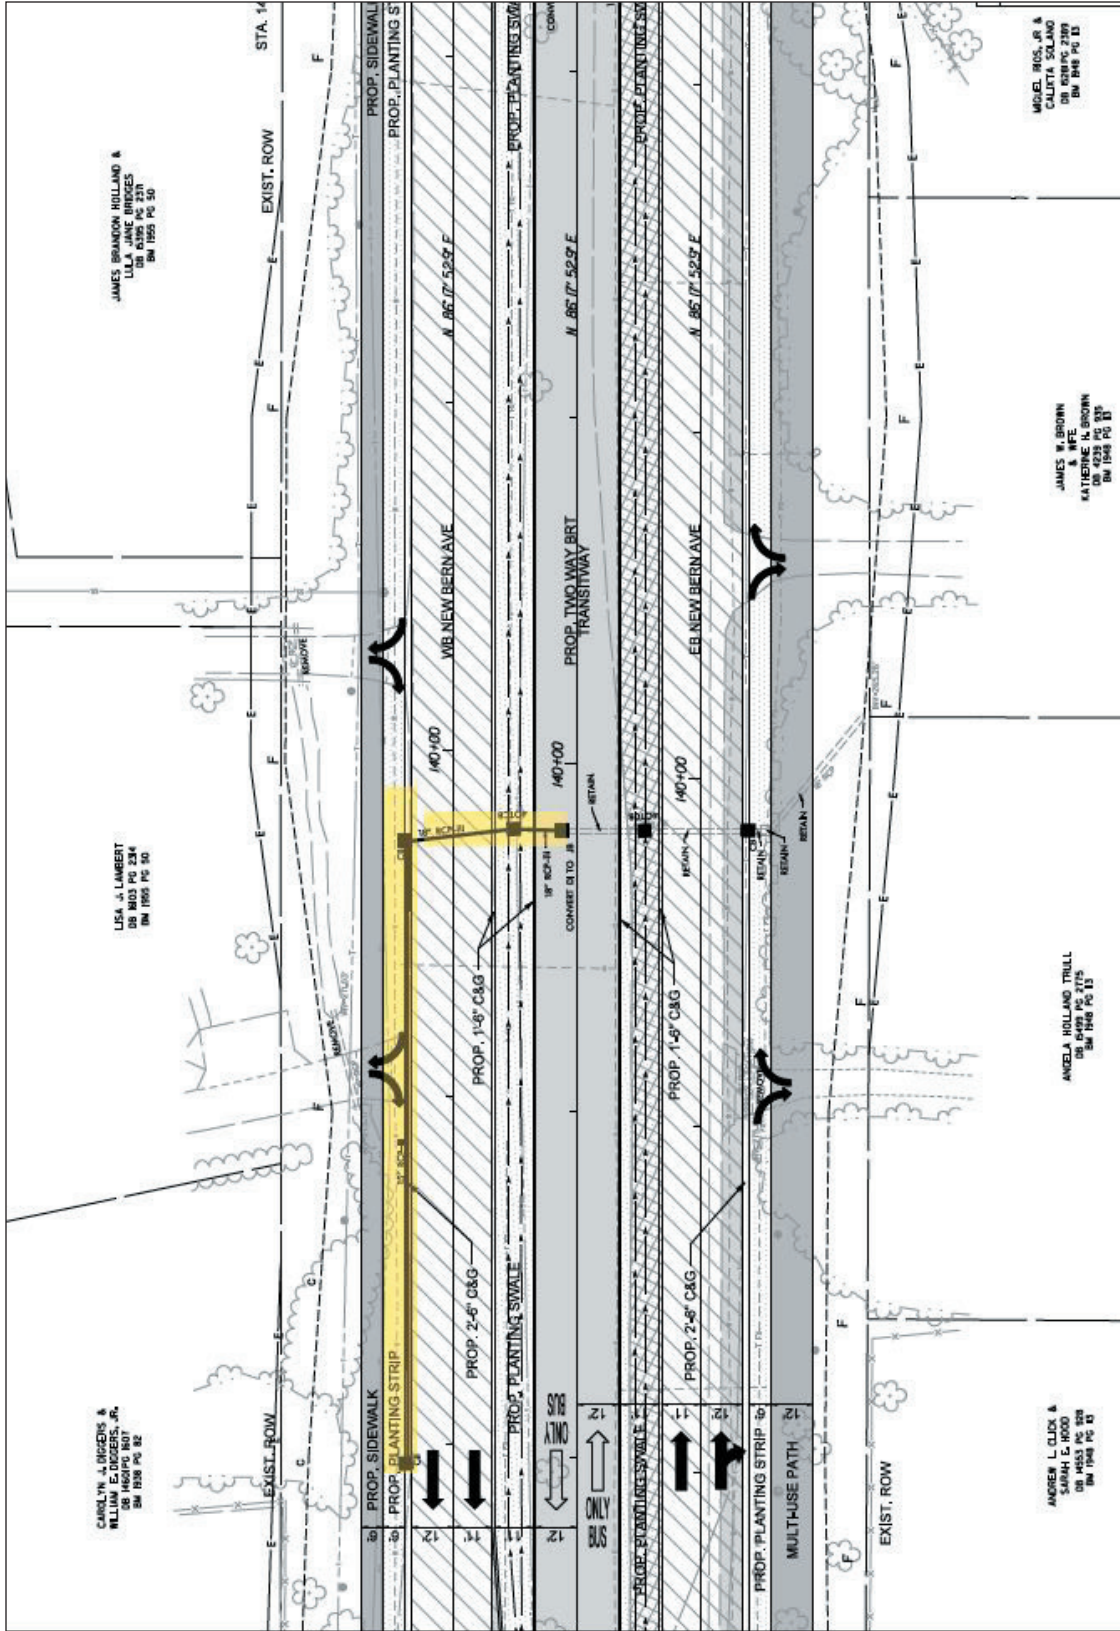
New Bern Avenue Improvements within Longview Gardens Historic District, Wake BRT New Bern Corridor Preliminary Plans, Sheet R-NBN-030, 2020
